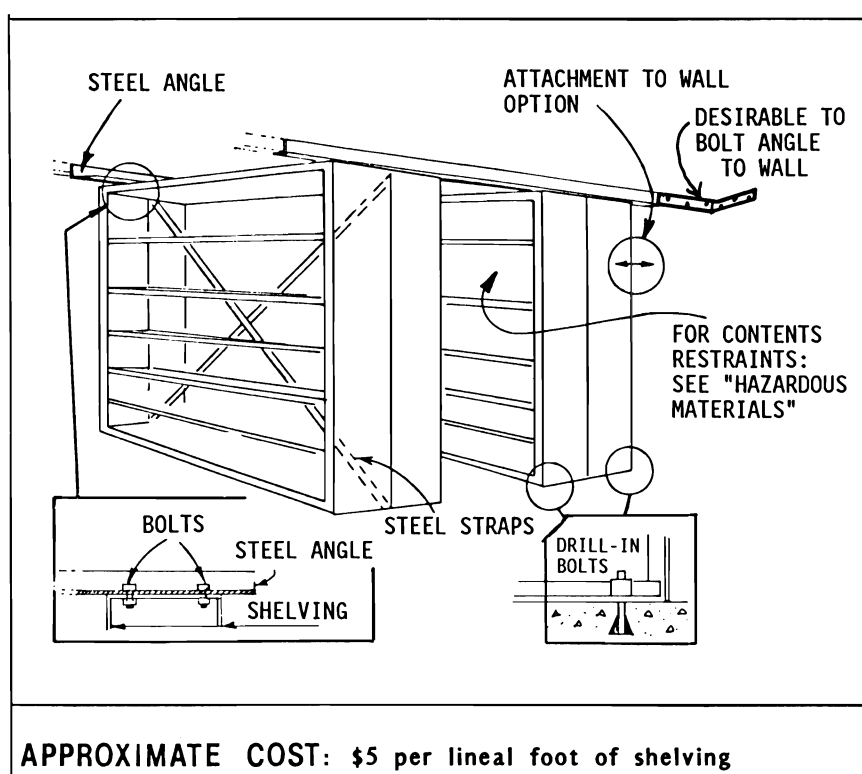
Tall shelving should be stabilized by connecting units rigidly to each other or anchoring them to walls.
